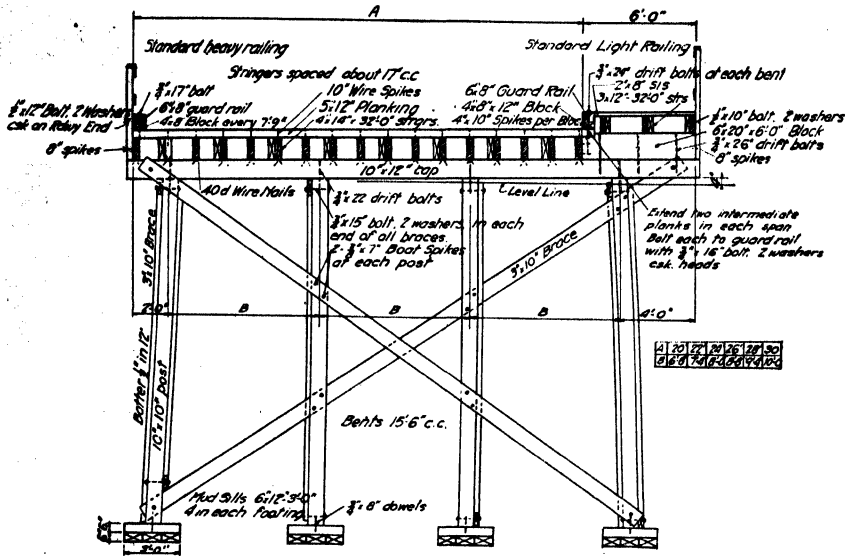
Typical section of roadway timber trestle, City of Seattle.
